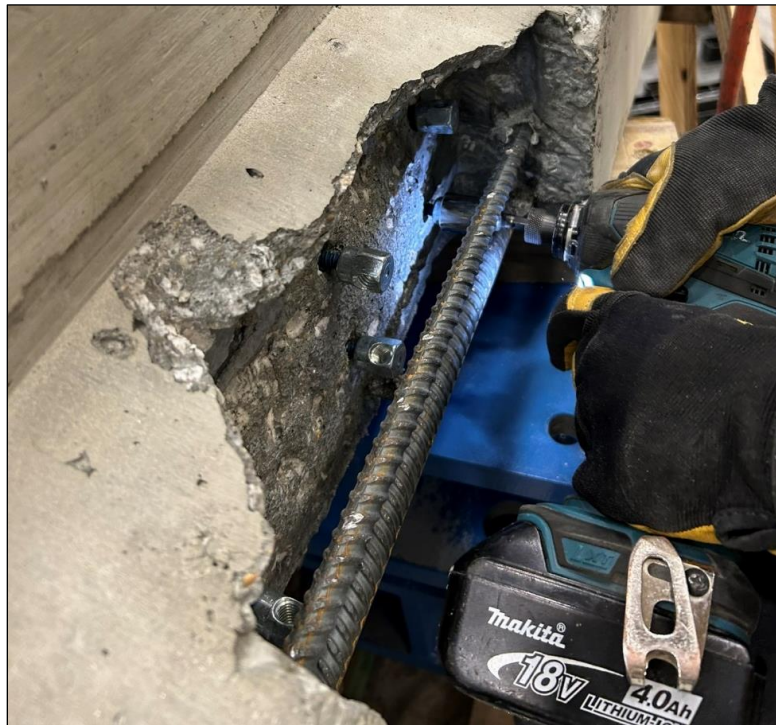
Photo. Practice installation of concrete anchors with holes in heads.
